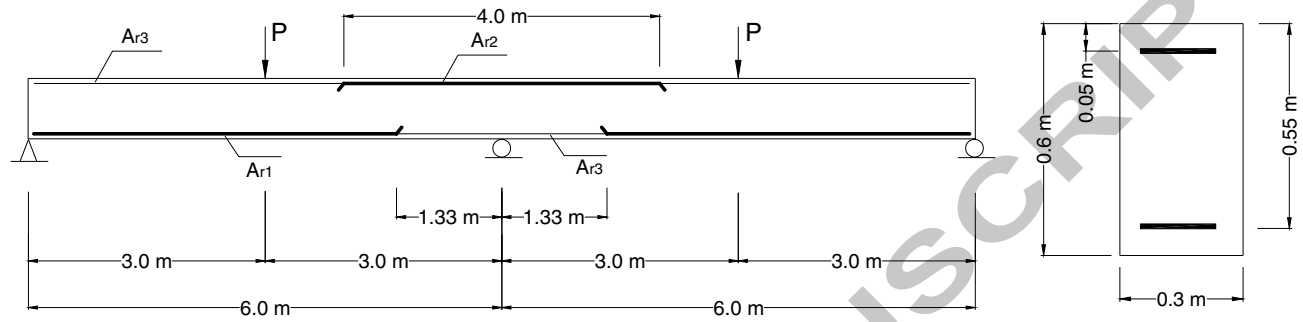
Details of reinforced concrete beam for numerical evaluation.
